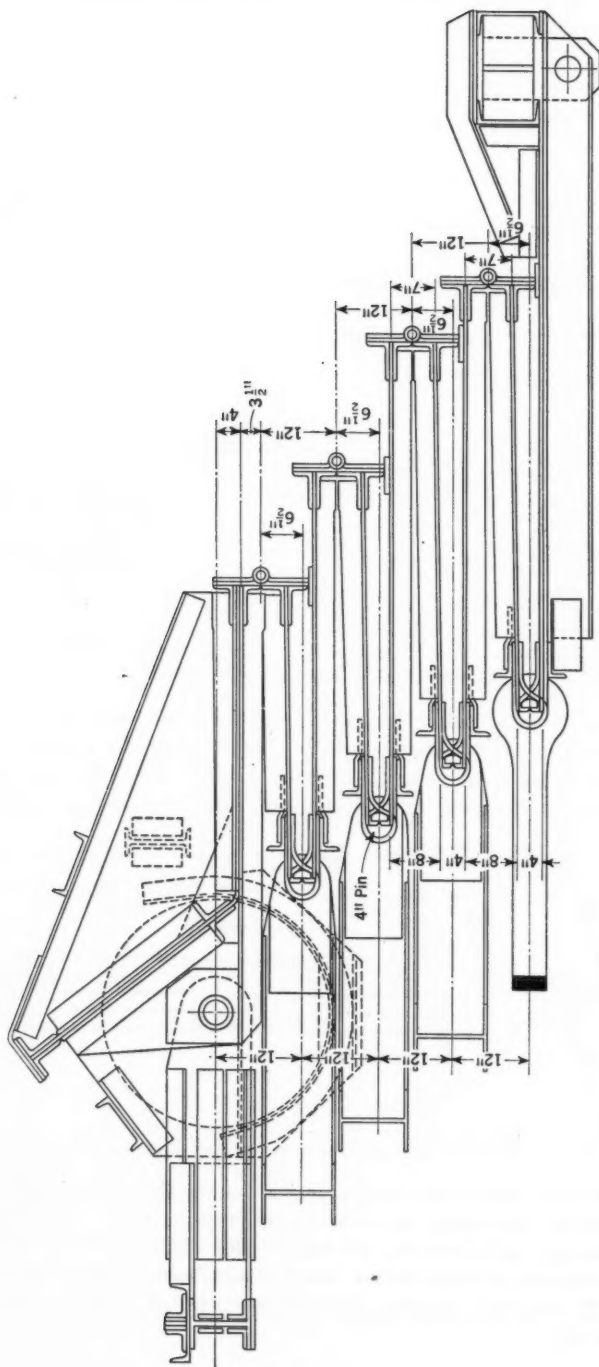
DETAILED VIEWS OF DAM IN A LOWERED POSITION
